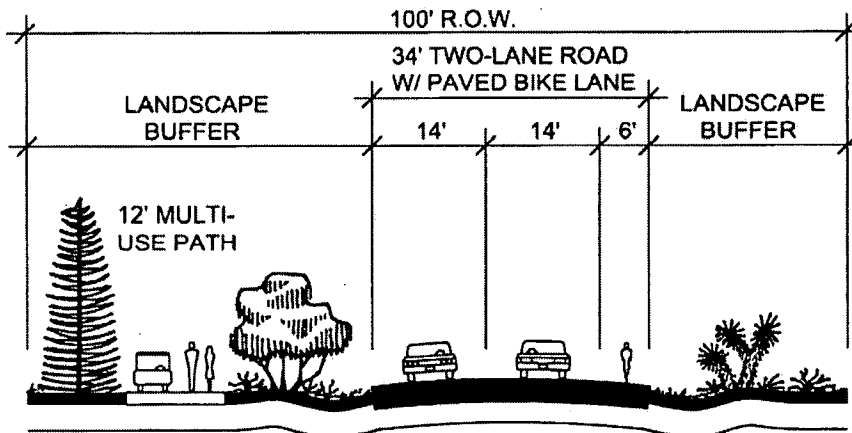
Cross Section – 2-Lane Road (100' ROW)
